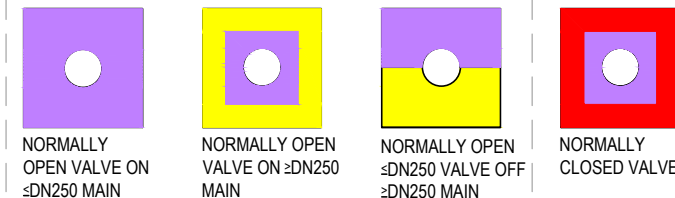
D: MARKER INSTALLATIONS EXAMPLES (PLAN VIEW)
